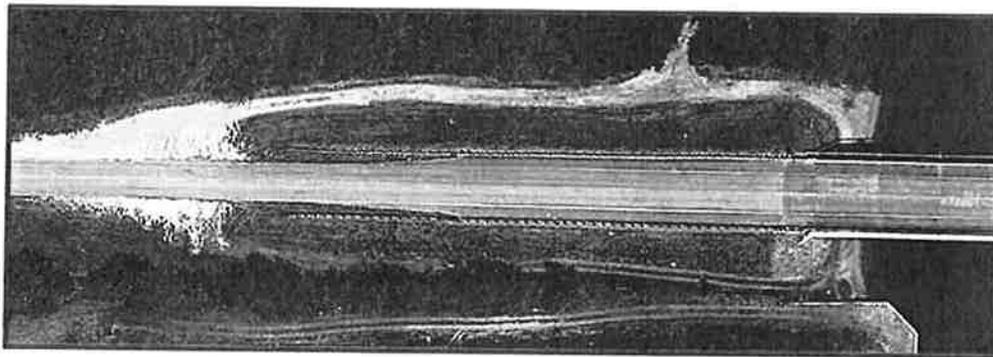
Roadway Transition at Bridge Approach (West Shown, East Similar)
